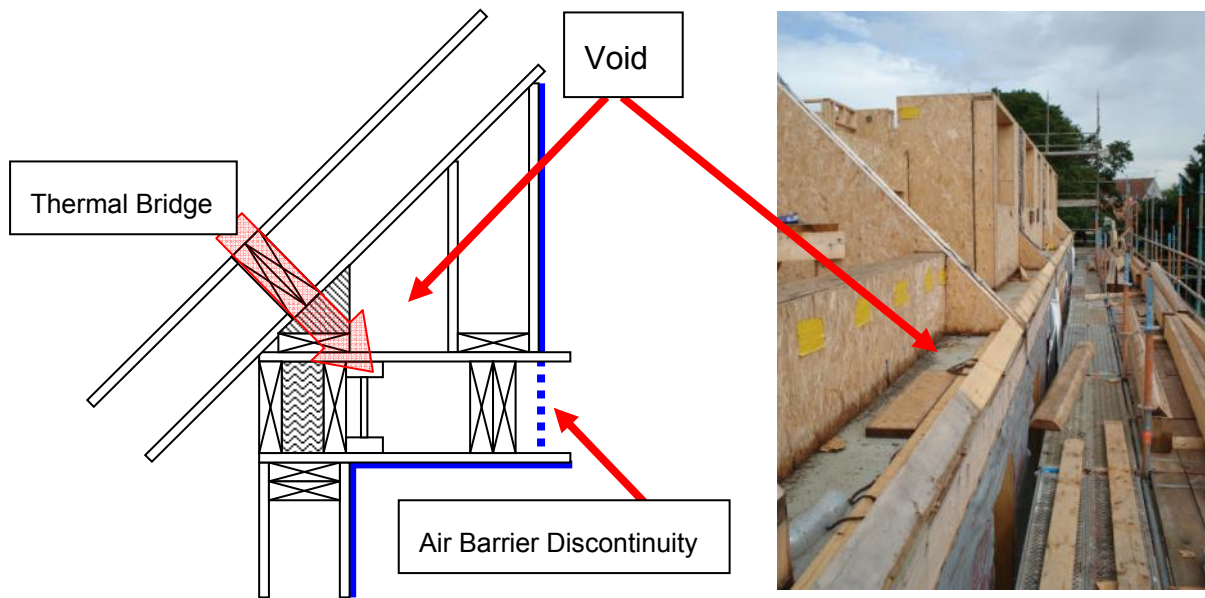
Schematic of Thermal Bypass at Ceiling Void
